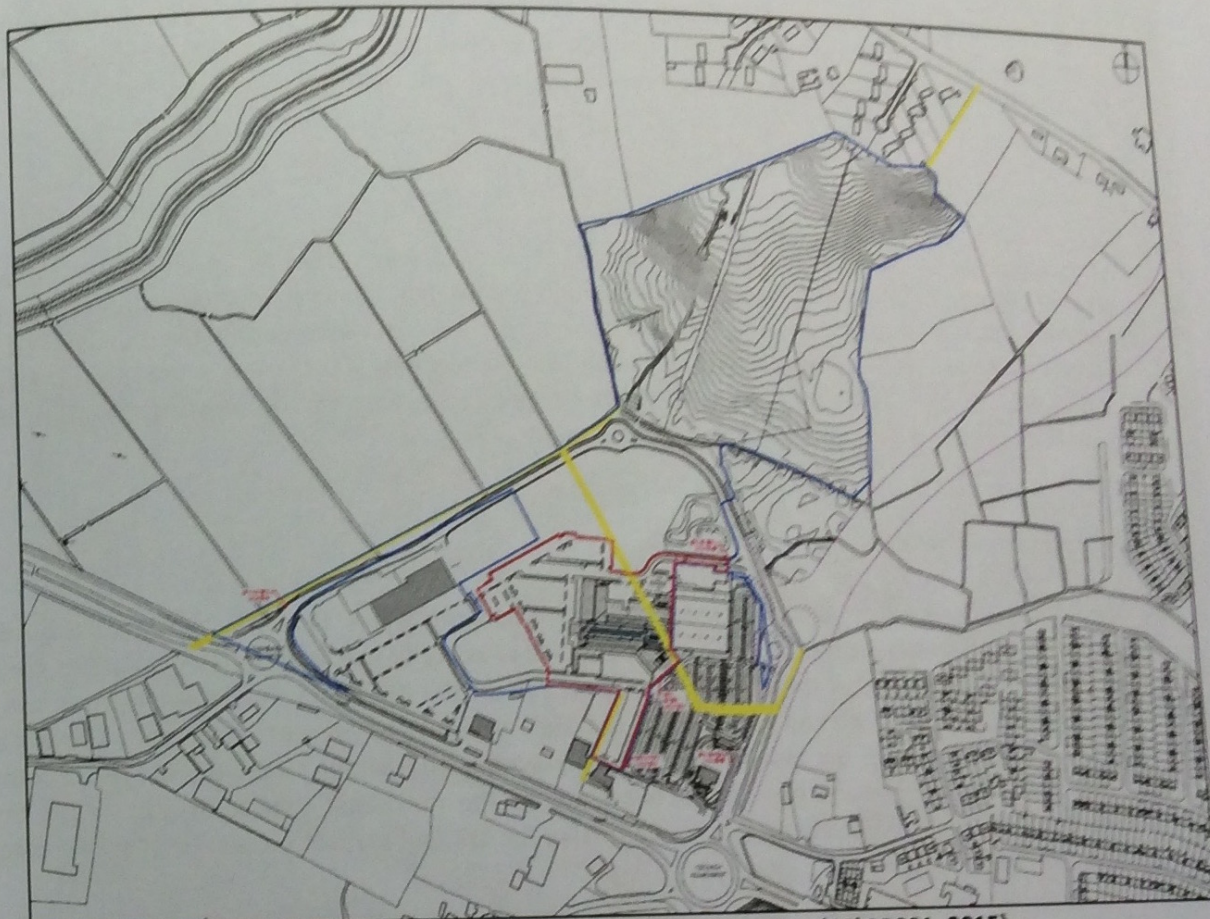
Site Location Plan. (Source: BDP Architects, Dwg No. (00)AP001, 2015)
